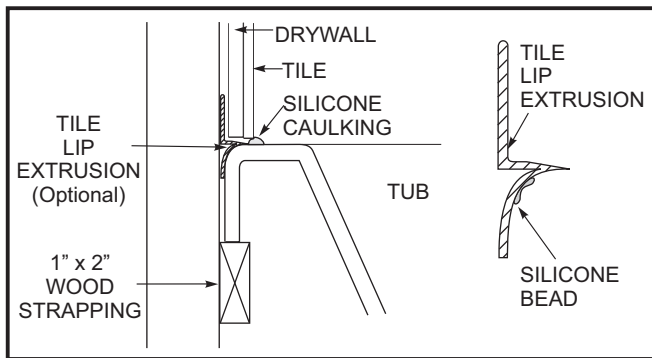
DROP-IN TUB IN ALCOVE INSTALLATION. WOOD STRAPPING, TILE LIP EXTRUSION AND WALL COVERING
